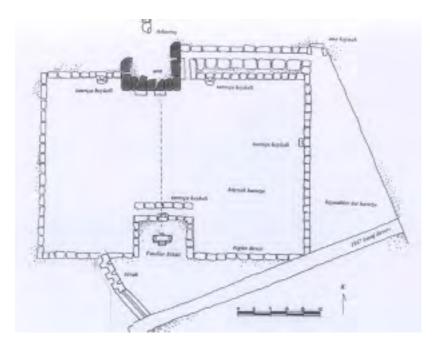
Site Plan Reconstruction Proposal, A. Cengizkan [19]
